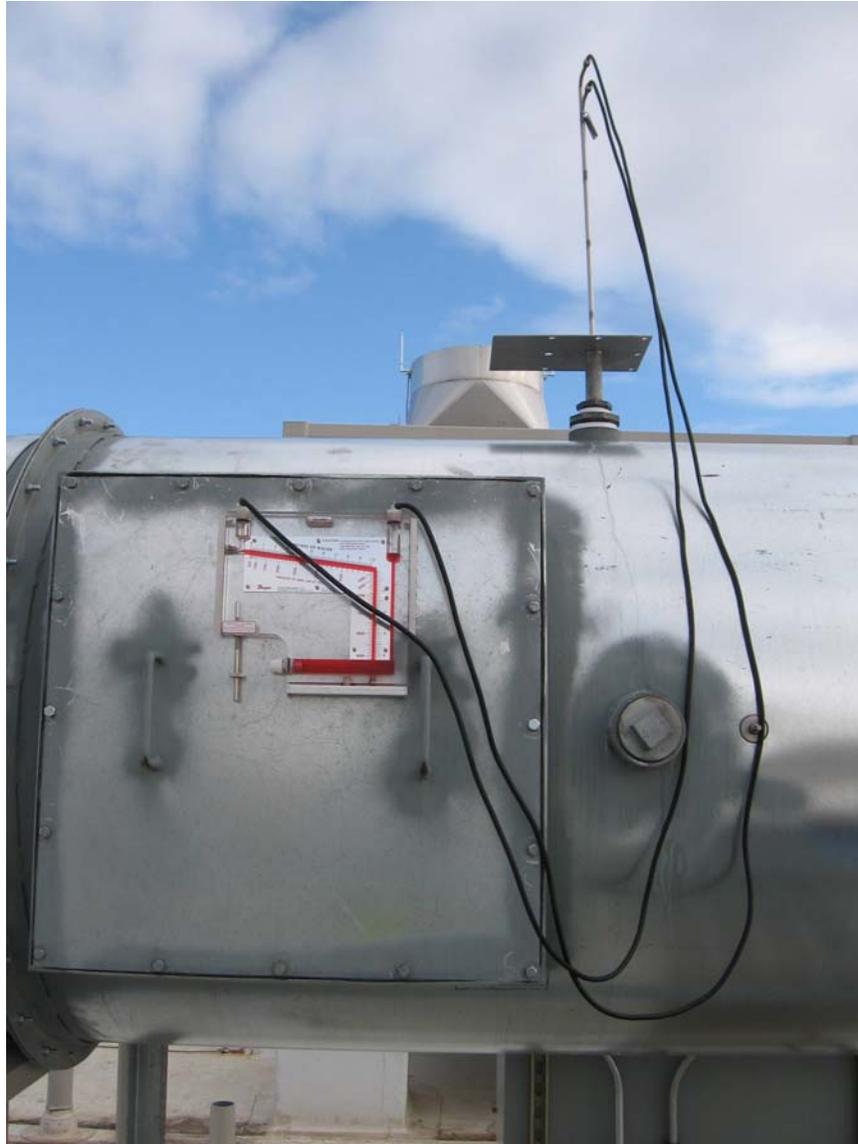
Slant Tube Manometer on Inspection Hatch Cover
